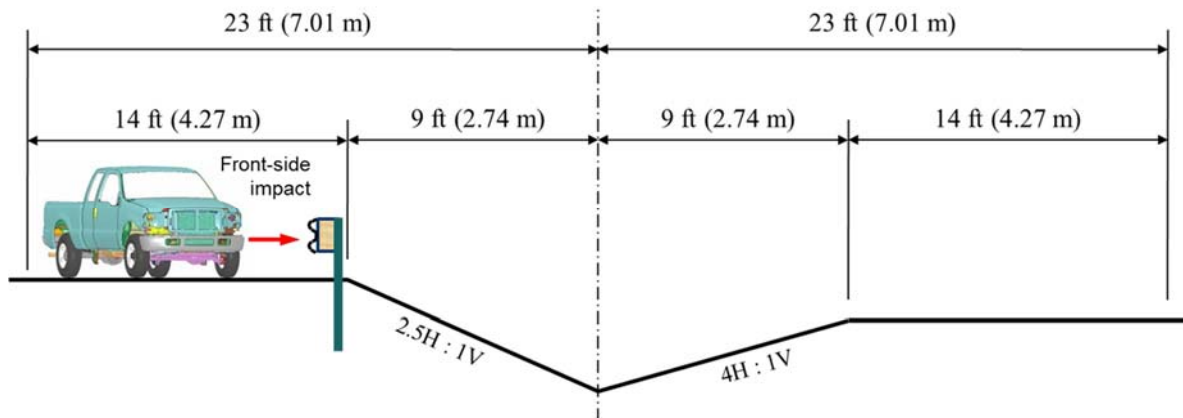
Front-side impact on a 46-foot sloped median with 29- and 31-inch single-faced guardrails installed on a 2.5H:1V slope.
